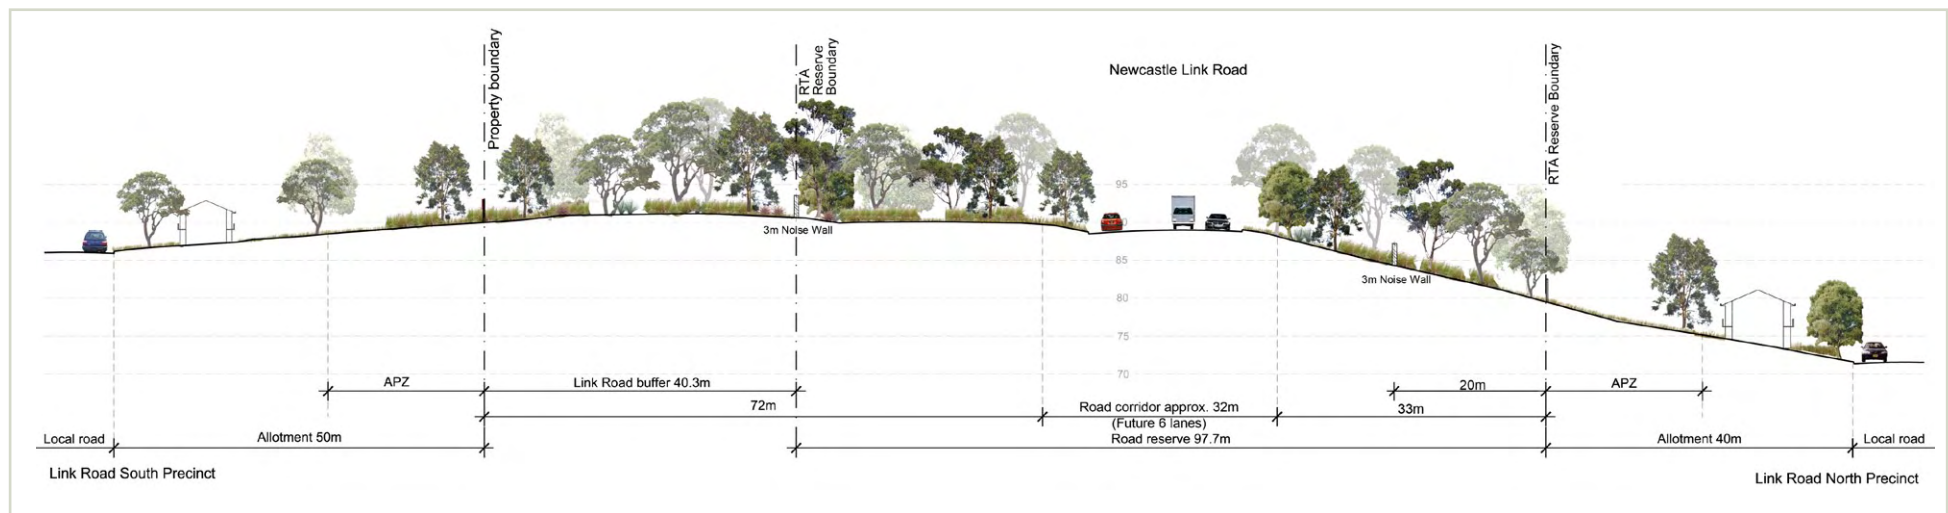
Newcastle Link Road - Link Road North Precinct to Link Road South (Section C-C)
